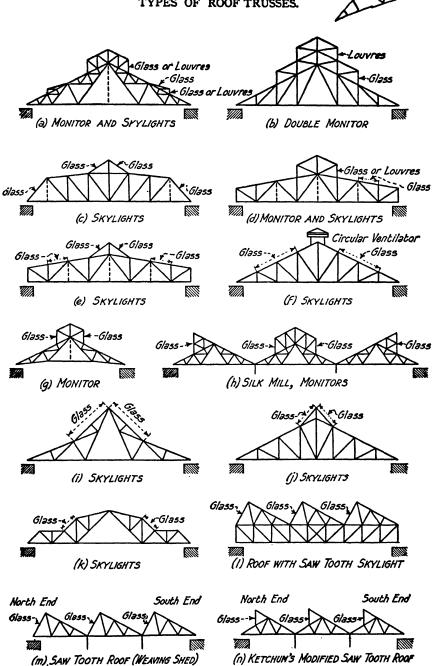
ROOF TRUSSES SHOWING METHODS OF LIGHTING AND VENTILATING.
